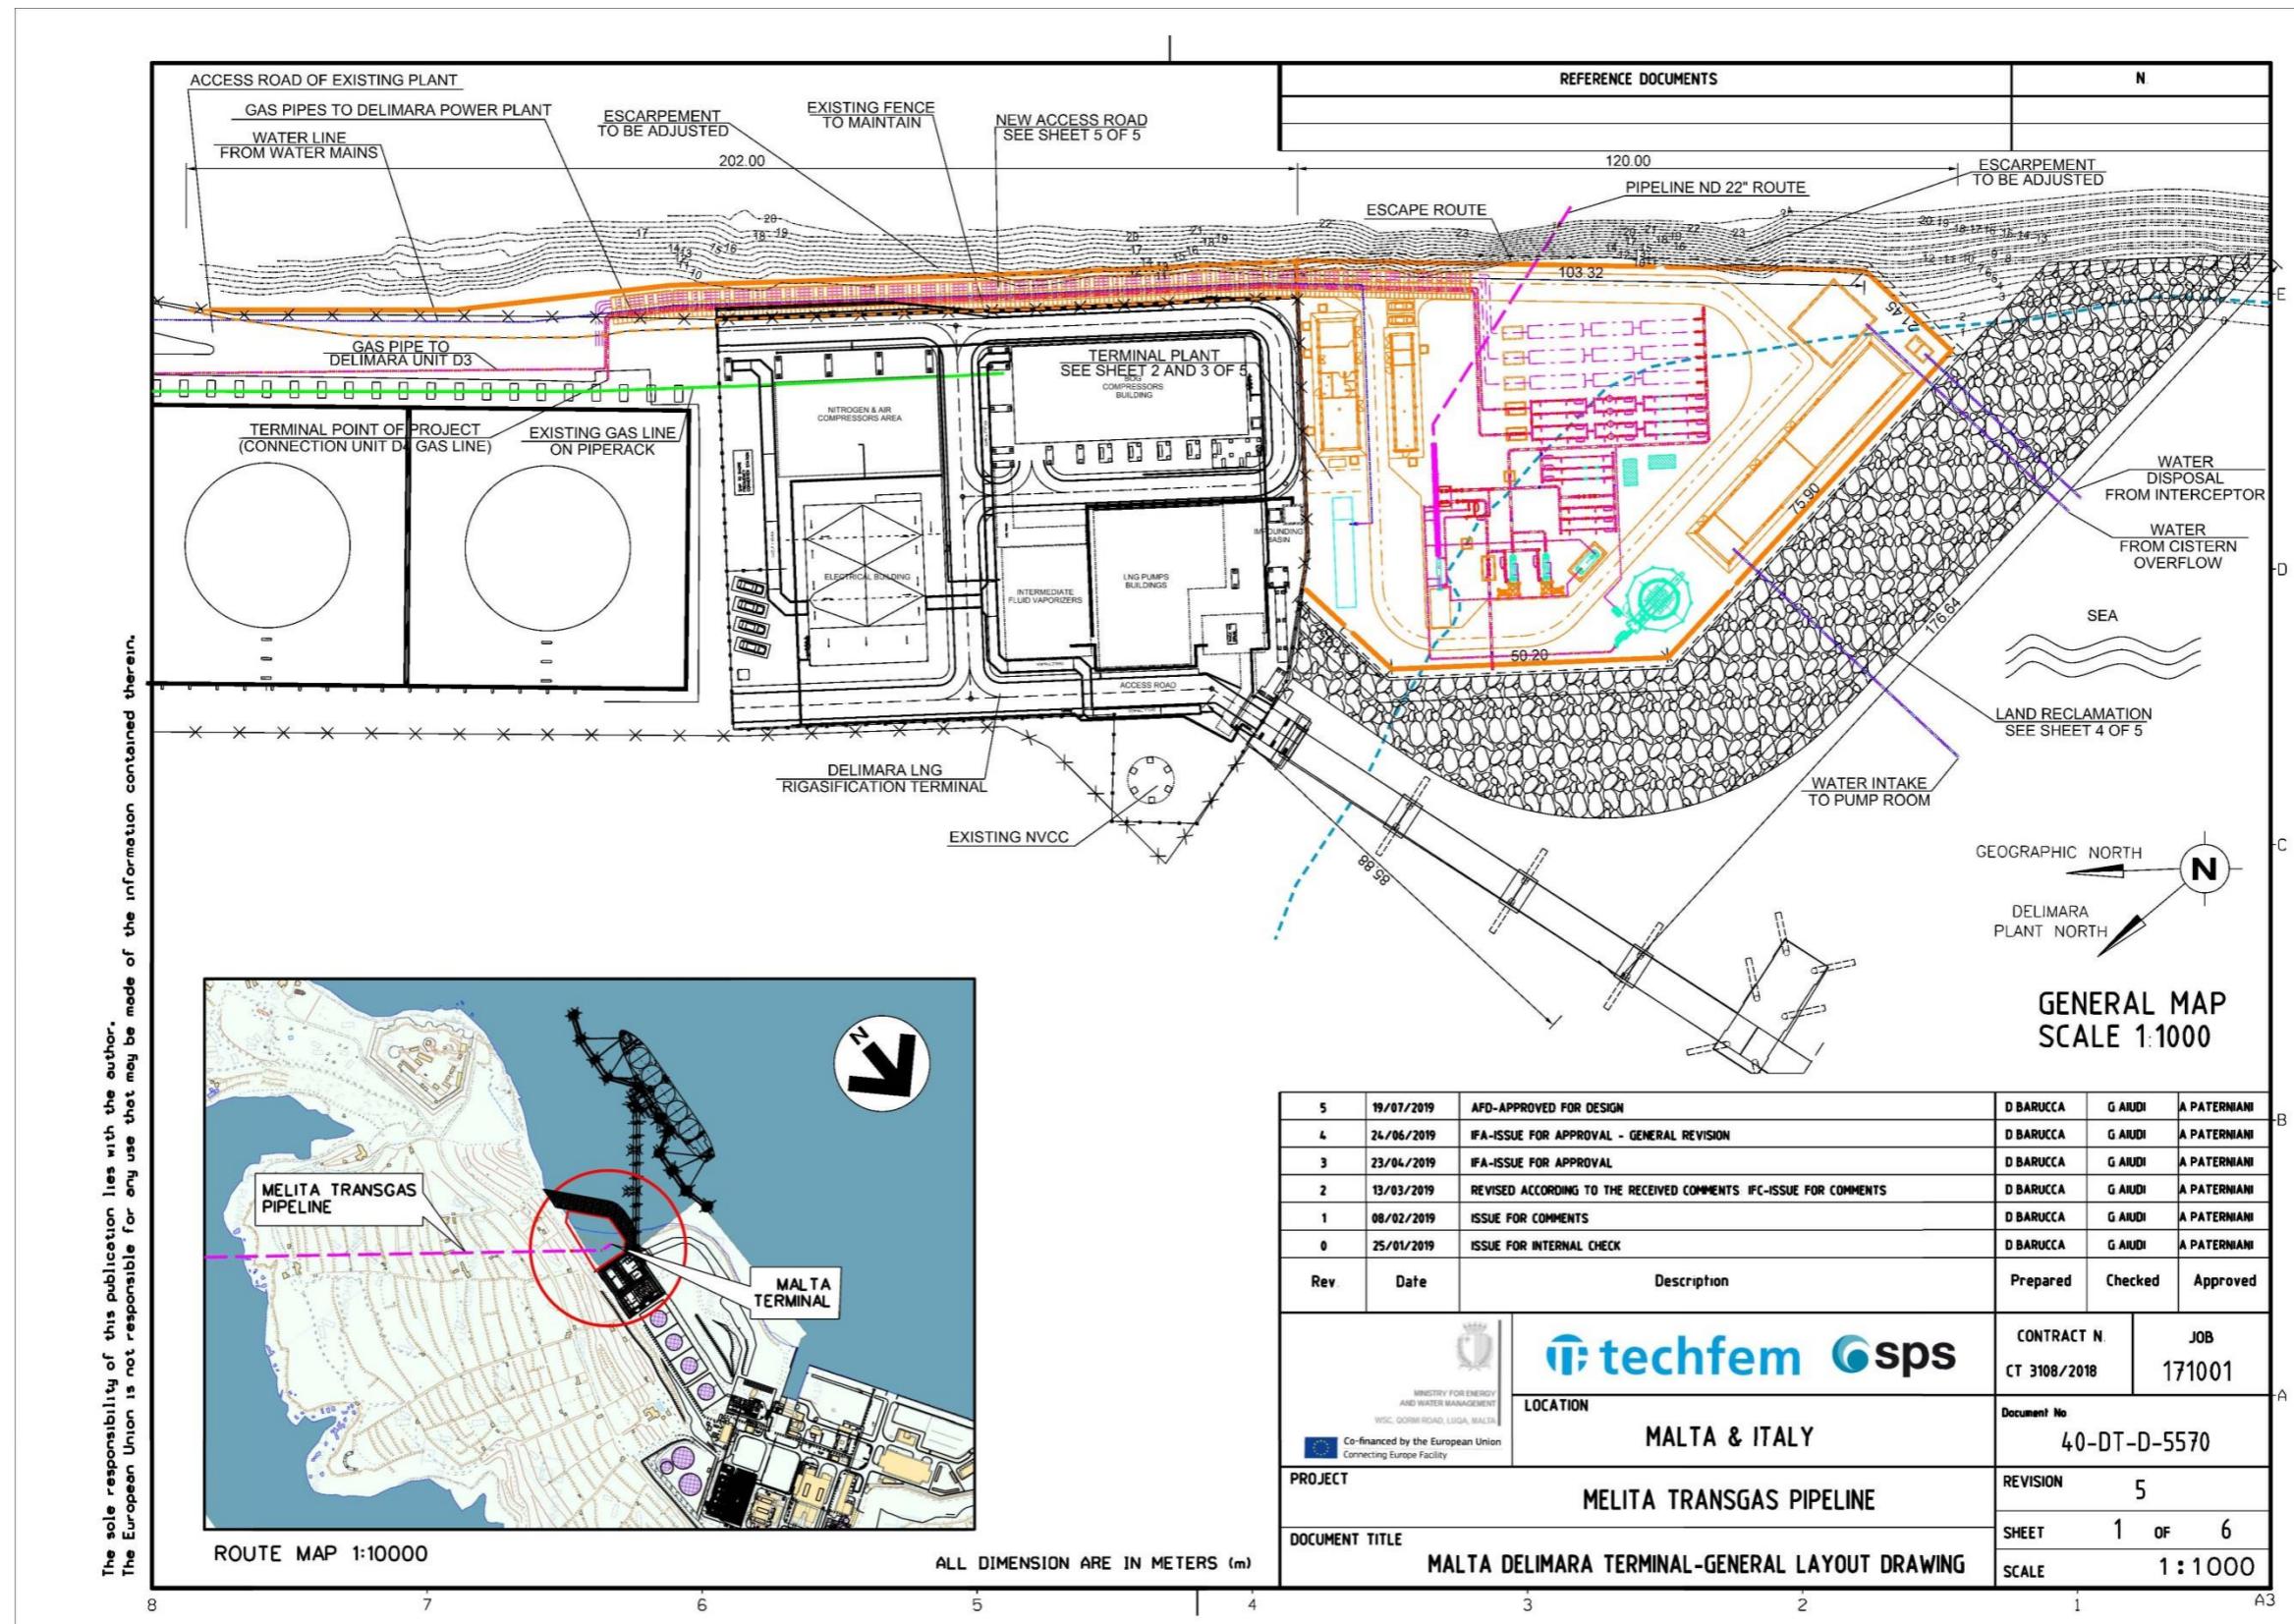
Site plan for the proposed Malta terminal and land reclamation area
